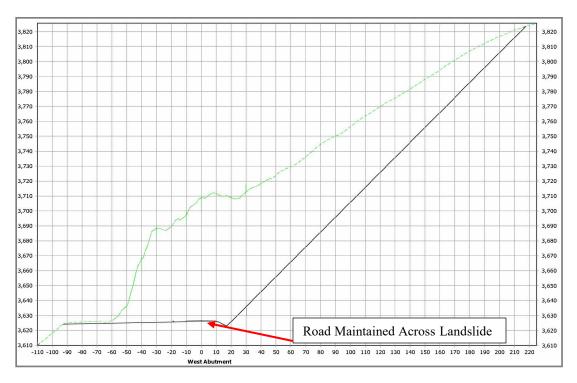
Cross section near the west abutment. Existing ground is represented by the green dashed line.
